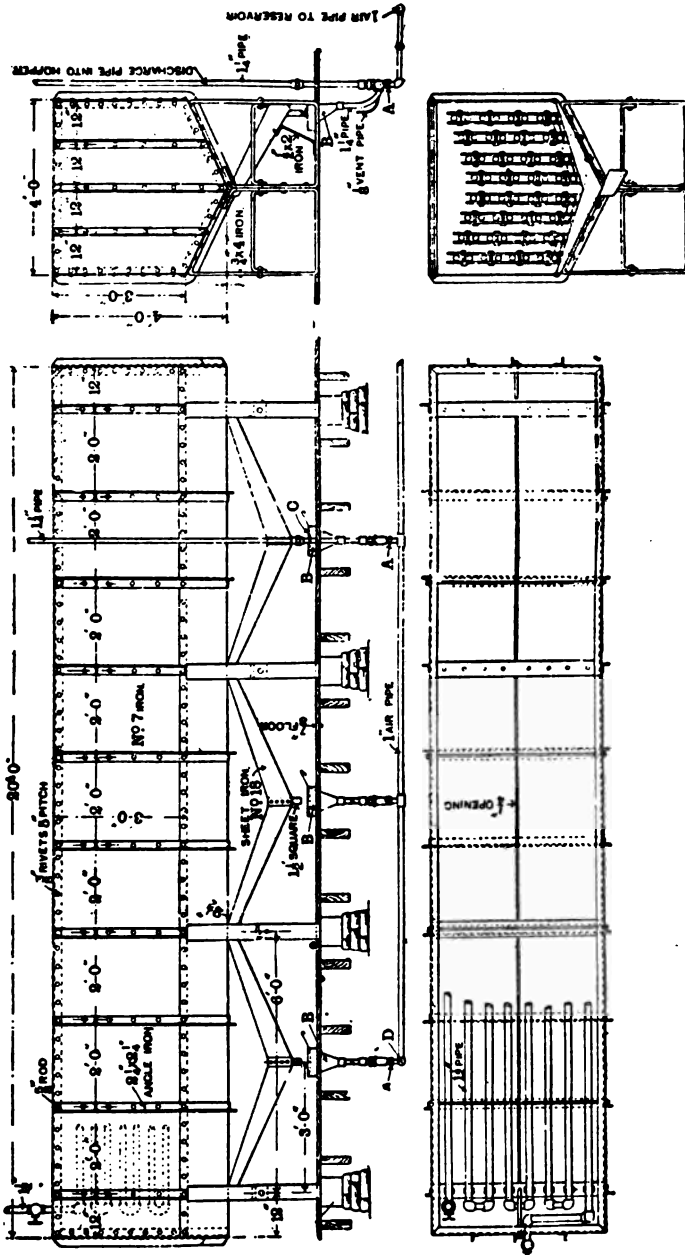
SAND PLANT, HORNELLSVILLE, N. Y.
